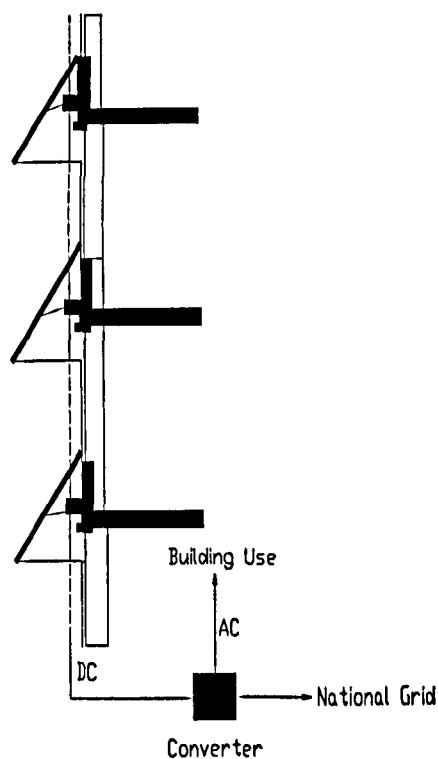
Schematic Cross sectional detail through the Northumberland Photovoltaic Façade.
